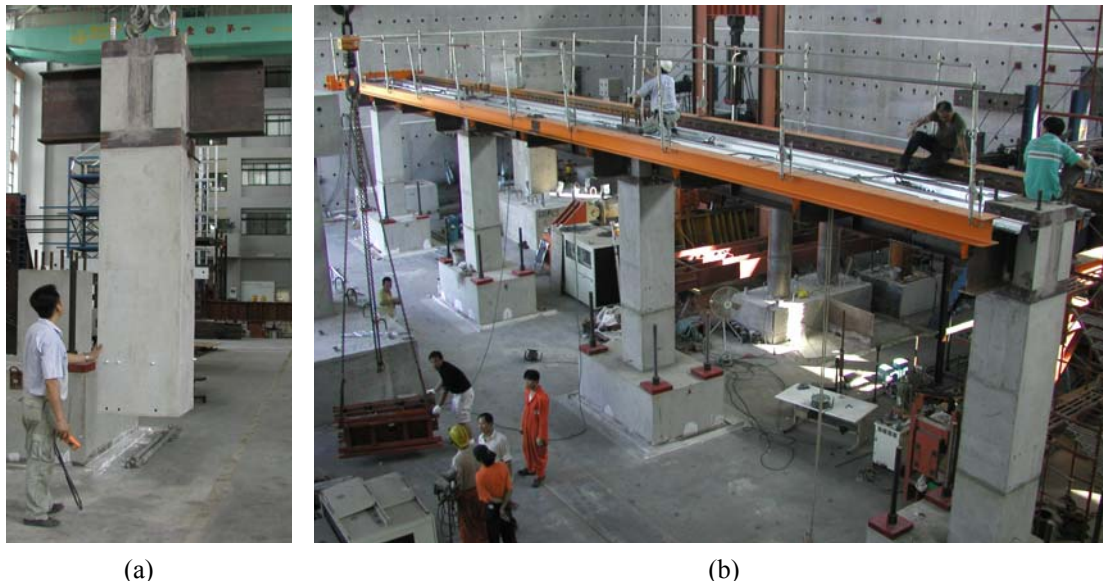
Construction photos of (a) a typical pre-cast beam-column module and (b) the completion of the first floor.
